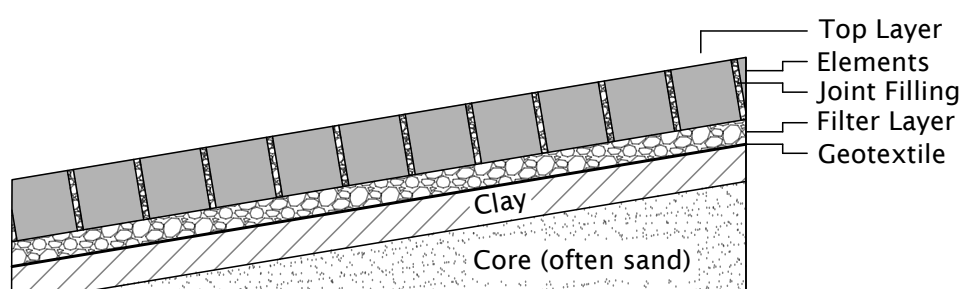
Detailed cross-section of a pattern-placed revetment on a dike
